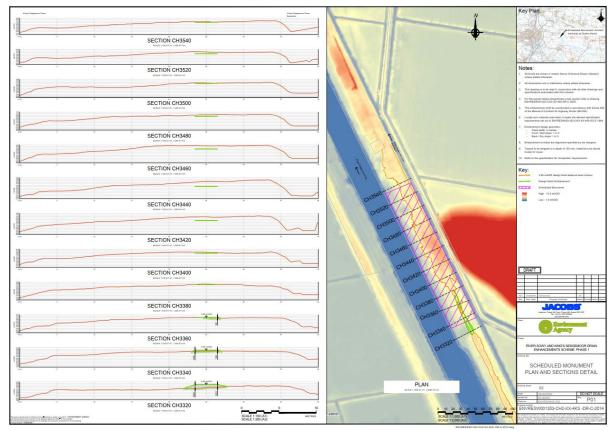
Plan and Section detail. Area of Timber track shown with pink line in plan view (i.e. extending from CH3340-CH3540)
